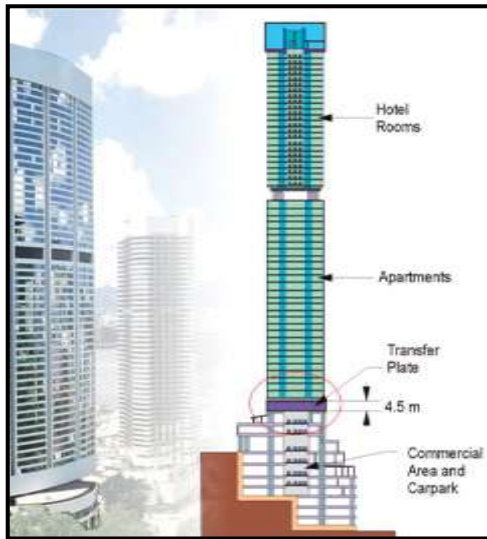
Transfer Floor System (Image Source: www. Google.com)
